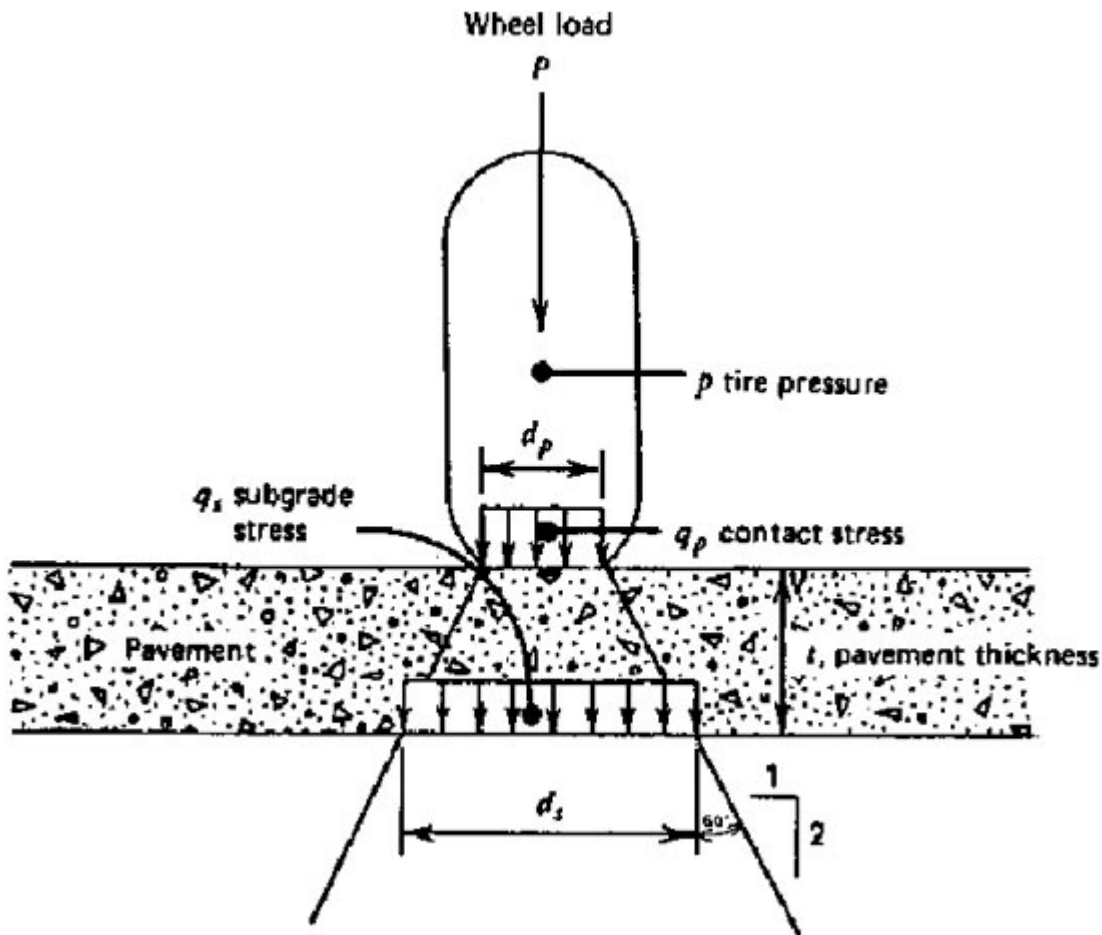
Definition of term describing wheel load transfer through pavement to subgrade.
